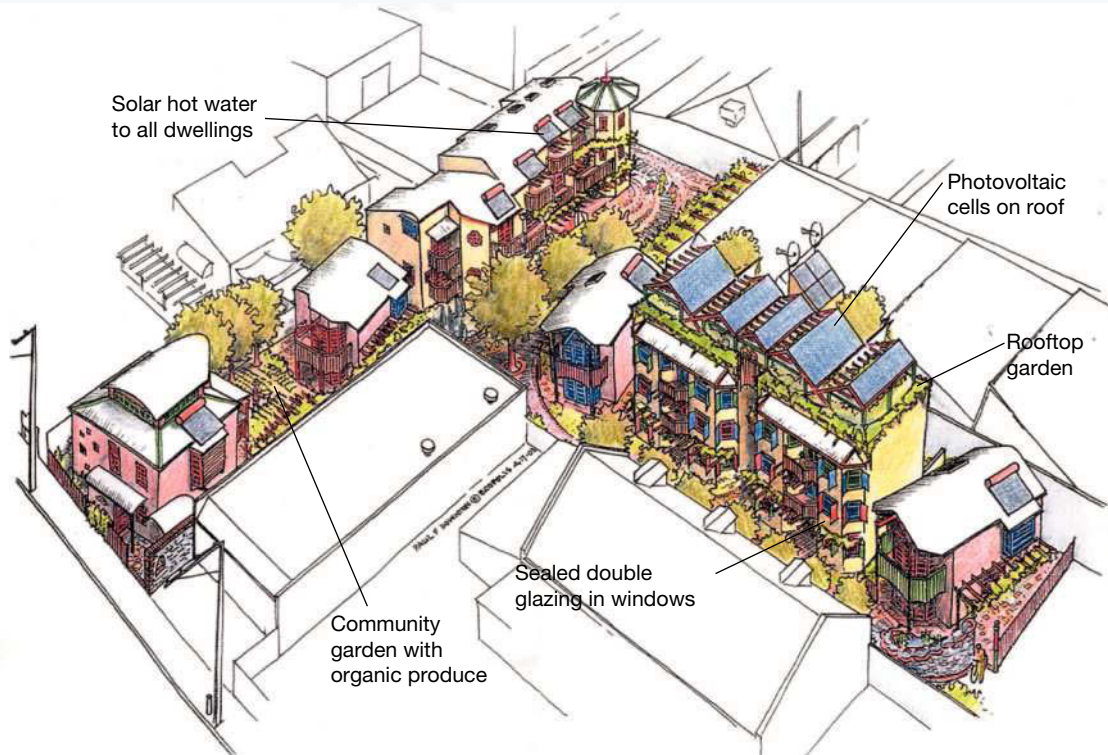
Rooftop gardens provide good insulation, protecting the buildings below from the hot sun in summer. In winter, they keep warmth from escaping from the building below.
